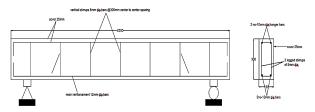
Cross Section of Beam with 0.6 Percentage of Flexural Reinforcement
